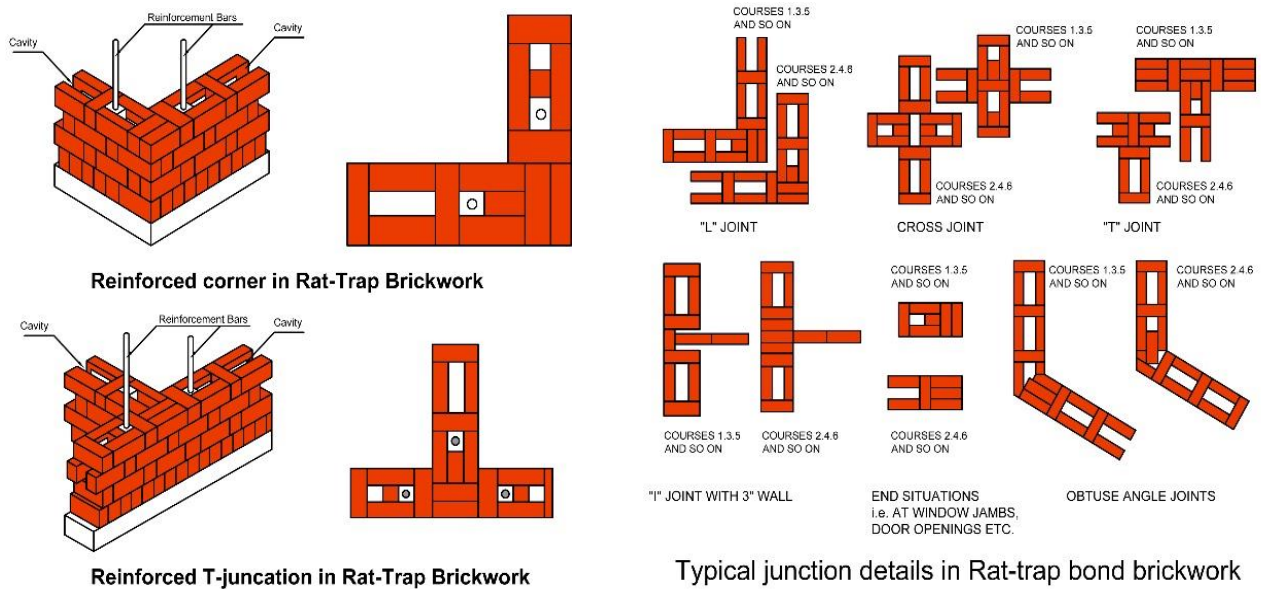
Joint and Reinforcement Details in Rat Trap Bond: Drawing Reproduced by Authors (Source: S. Saileysh Sivaraj *et al.*, 2012)
